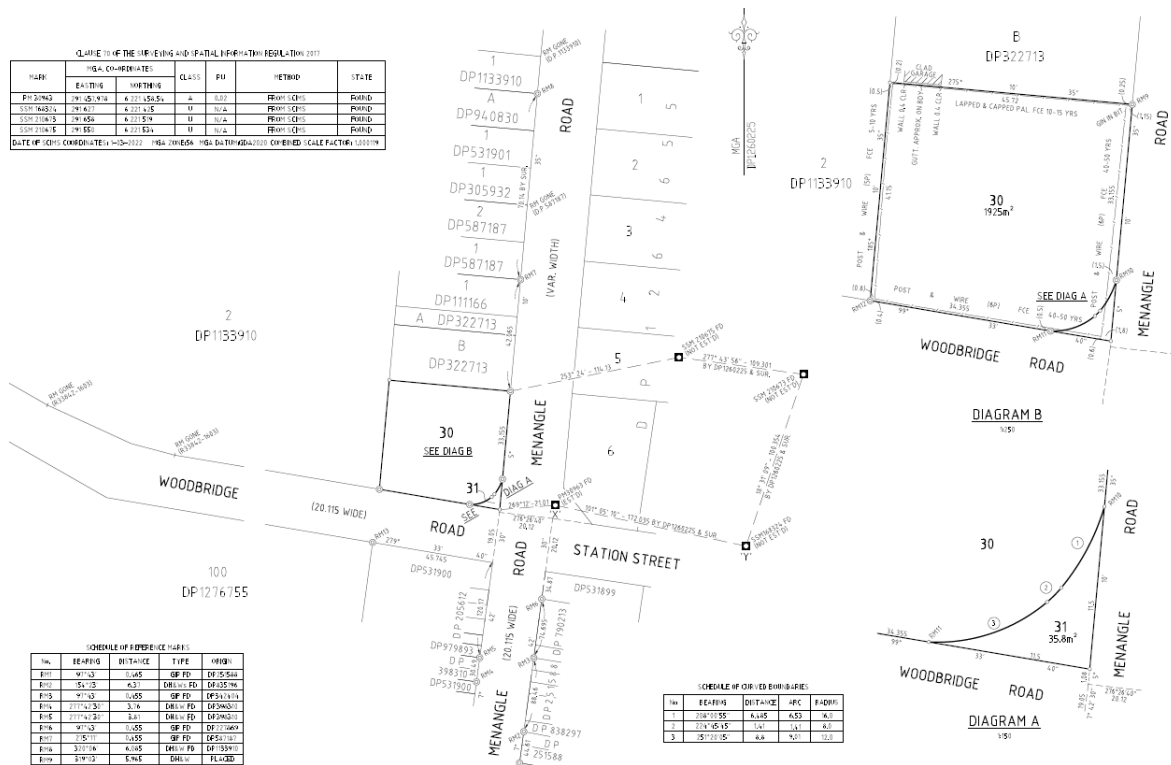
Proposed subdivision plan to facilitate the construction of roundabout
